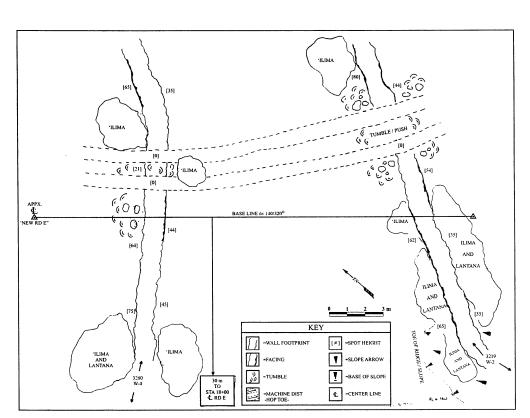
Road E, Site -3280 (W-4) and Site -3219 (W-2) Plan View Map
